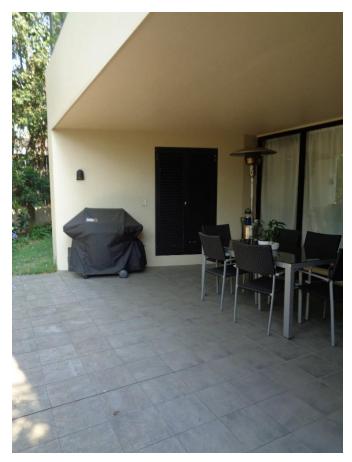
Rear courtyard facing west showing area of the proposed extension into the terrace
